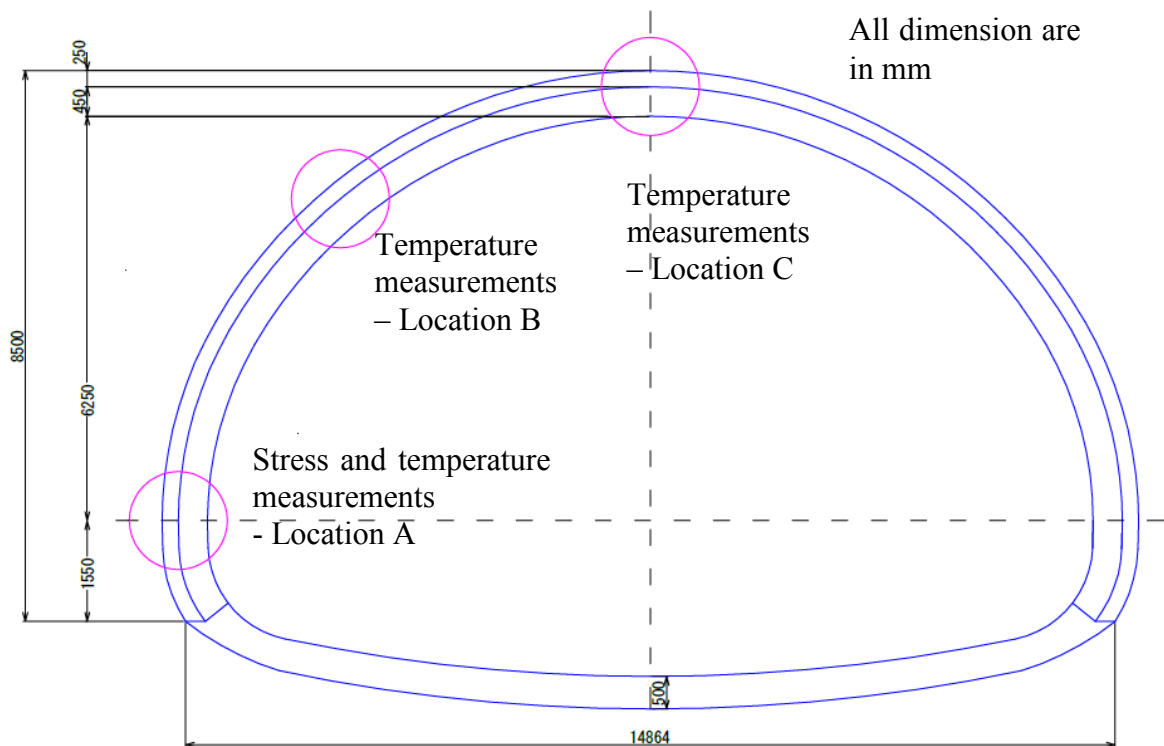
Measurement locations and tunnel dimensions of Kodsuchi tunnel
